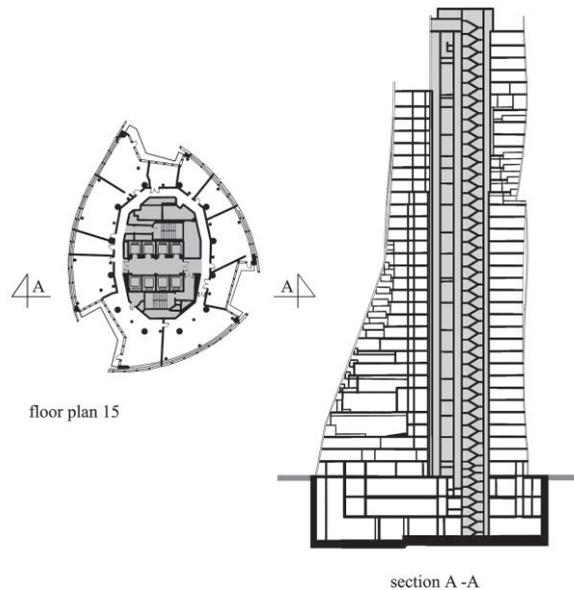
Mode Gakuen Spiral Towers: floor plan and section, developed by authors [17]
